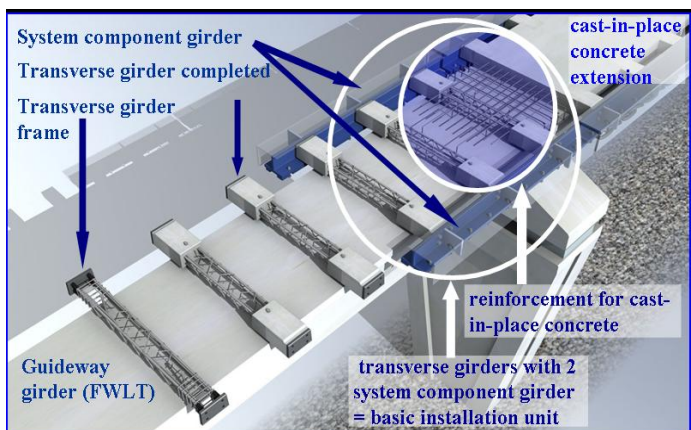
Track of Type II, BGmU design (Source: BGmU)
